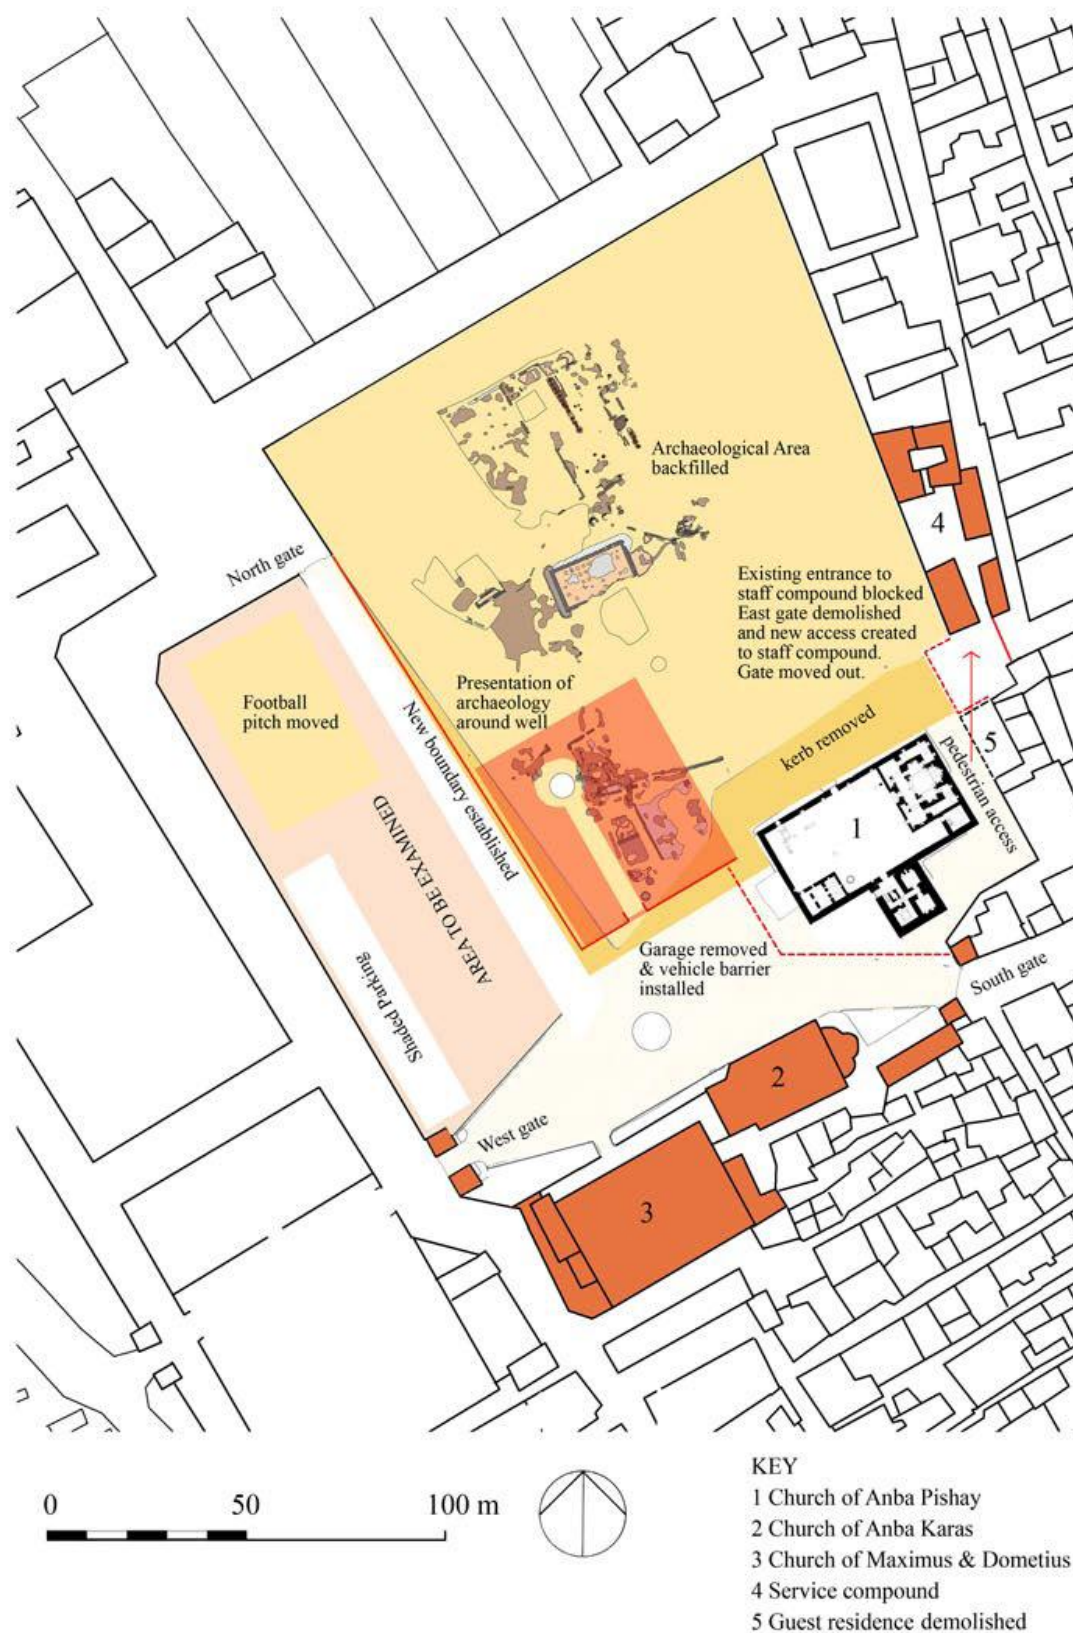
Plan of proposed interventions outside the church (drawing 2011: N. Warner)
